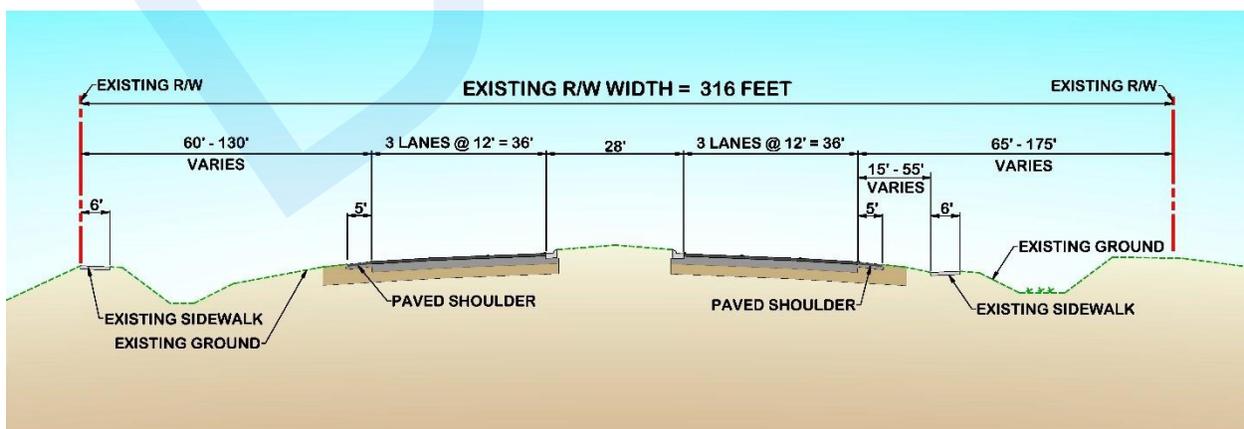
Existing SW 10th Street Typical Section – Quiet Water Business Park Entrance Road to Military Trail
